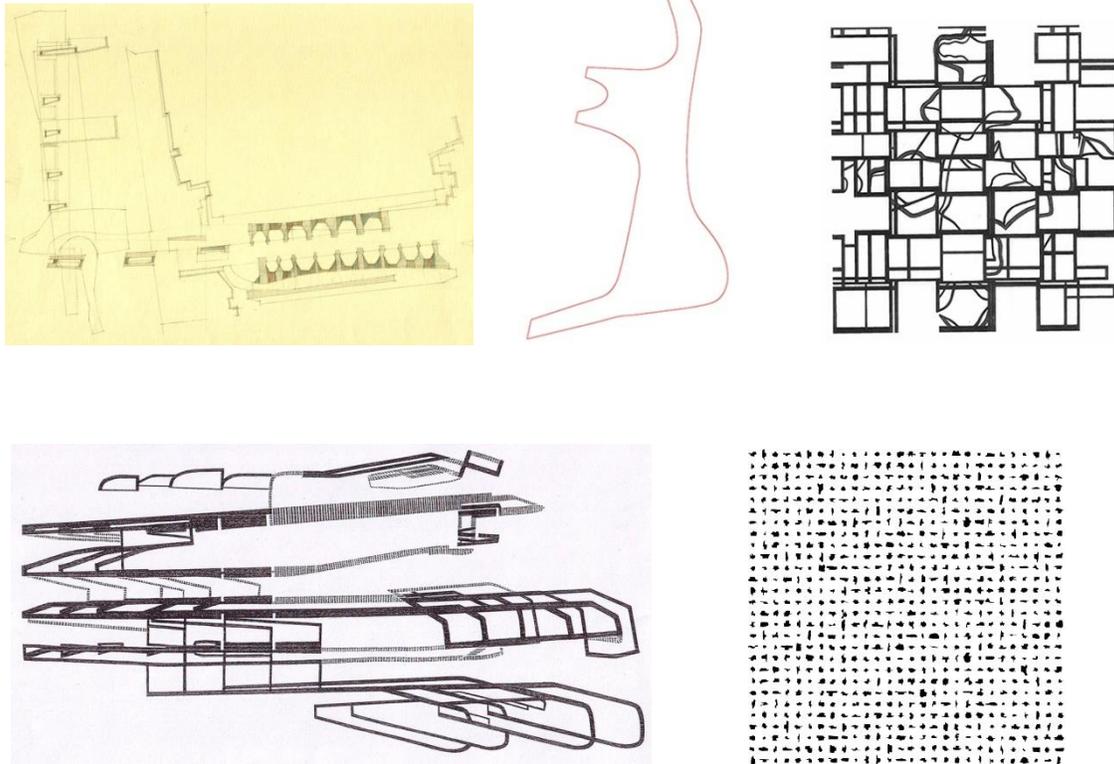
Various types of drawings: Plan of a Monastery / plan of column / combinatorial plan / 841 templates (category/collection) / Plan repetition
